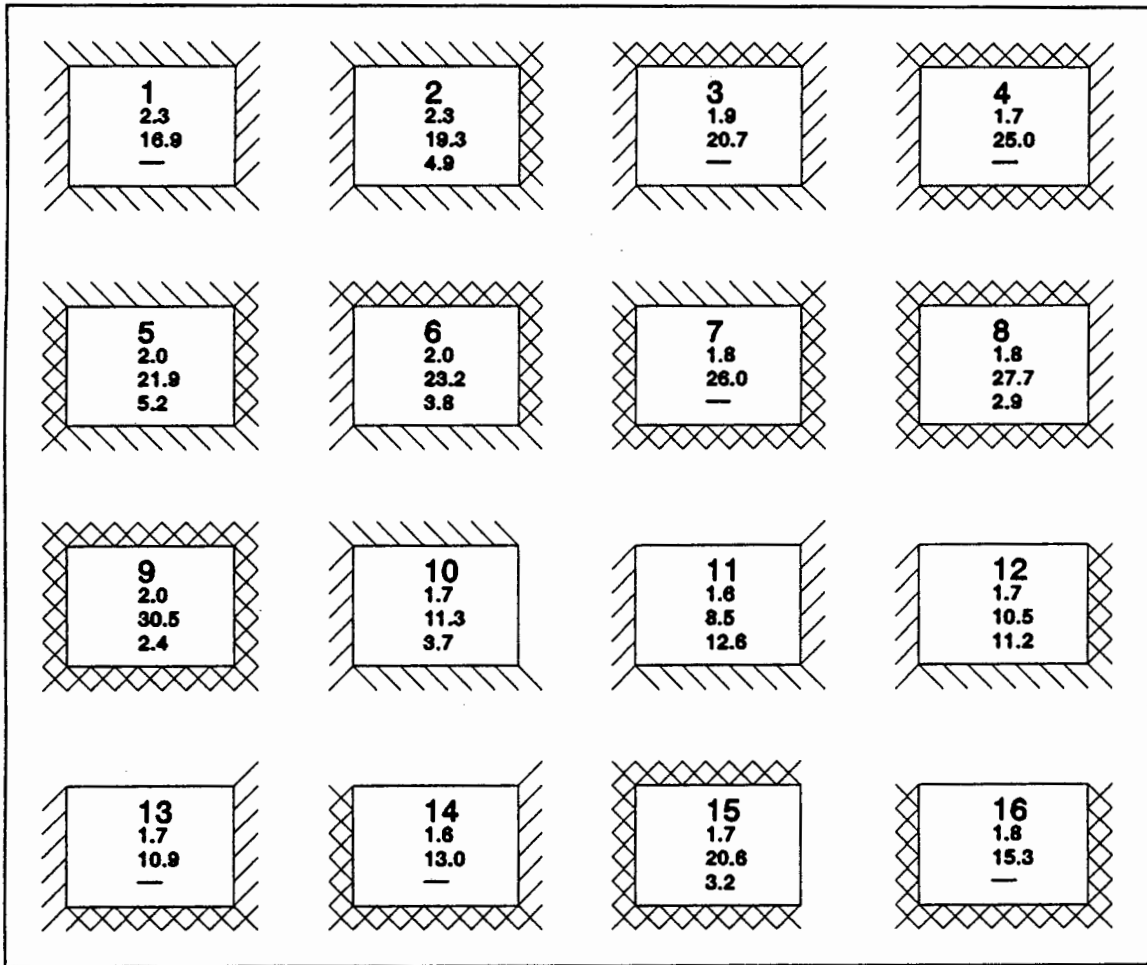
Slab configurations for Rectangular Slabs Jackson
